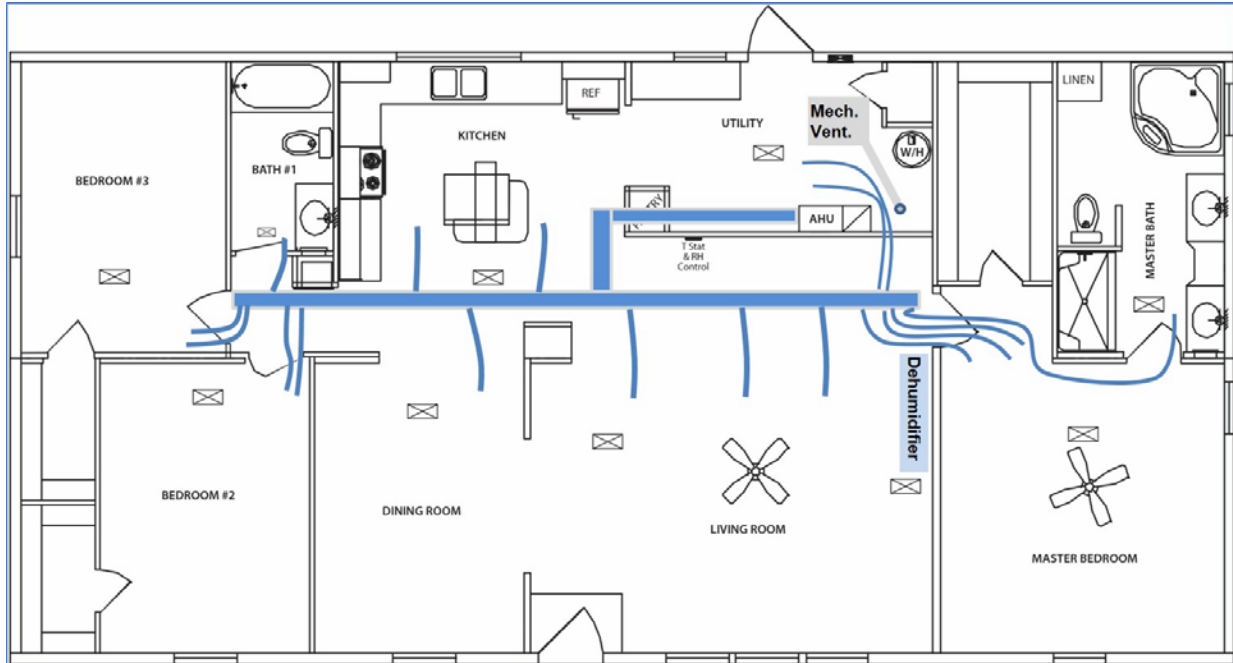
Manufactured home laboratory floor plan and equipment layout
